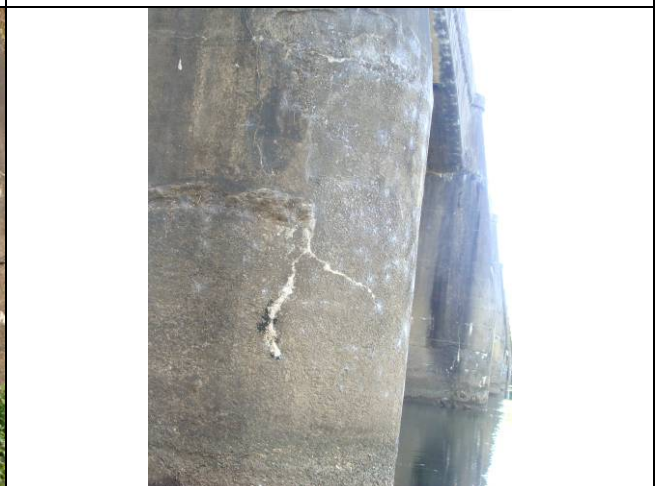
(B-43)Span 4 Pier 4 column 1 Upstream crack at joint
